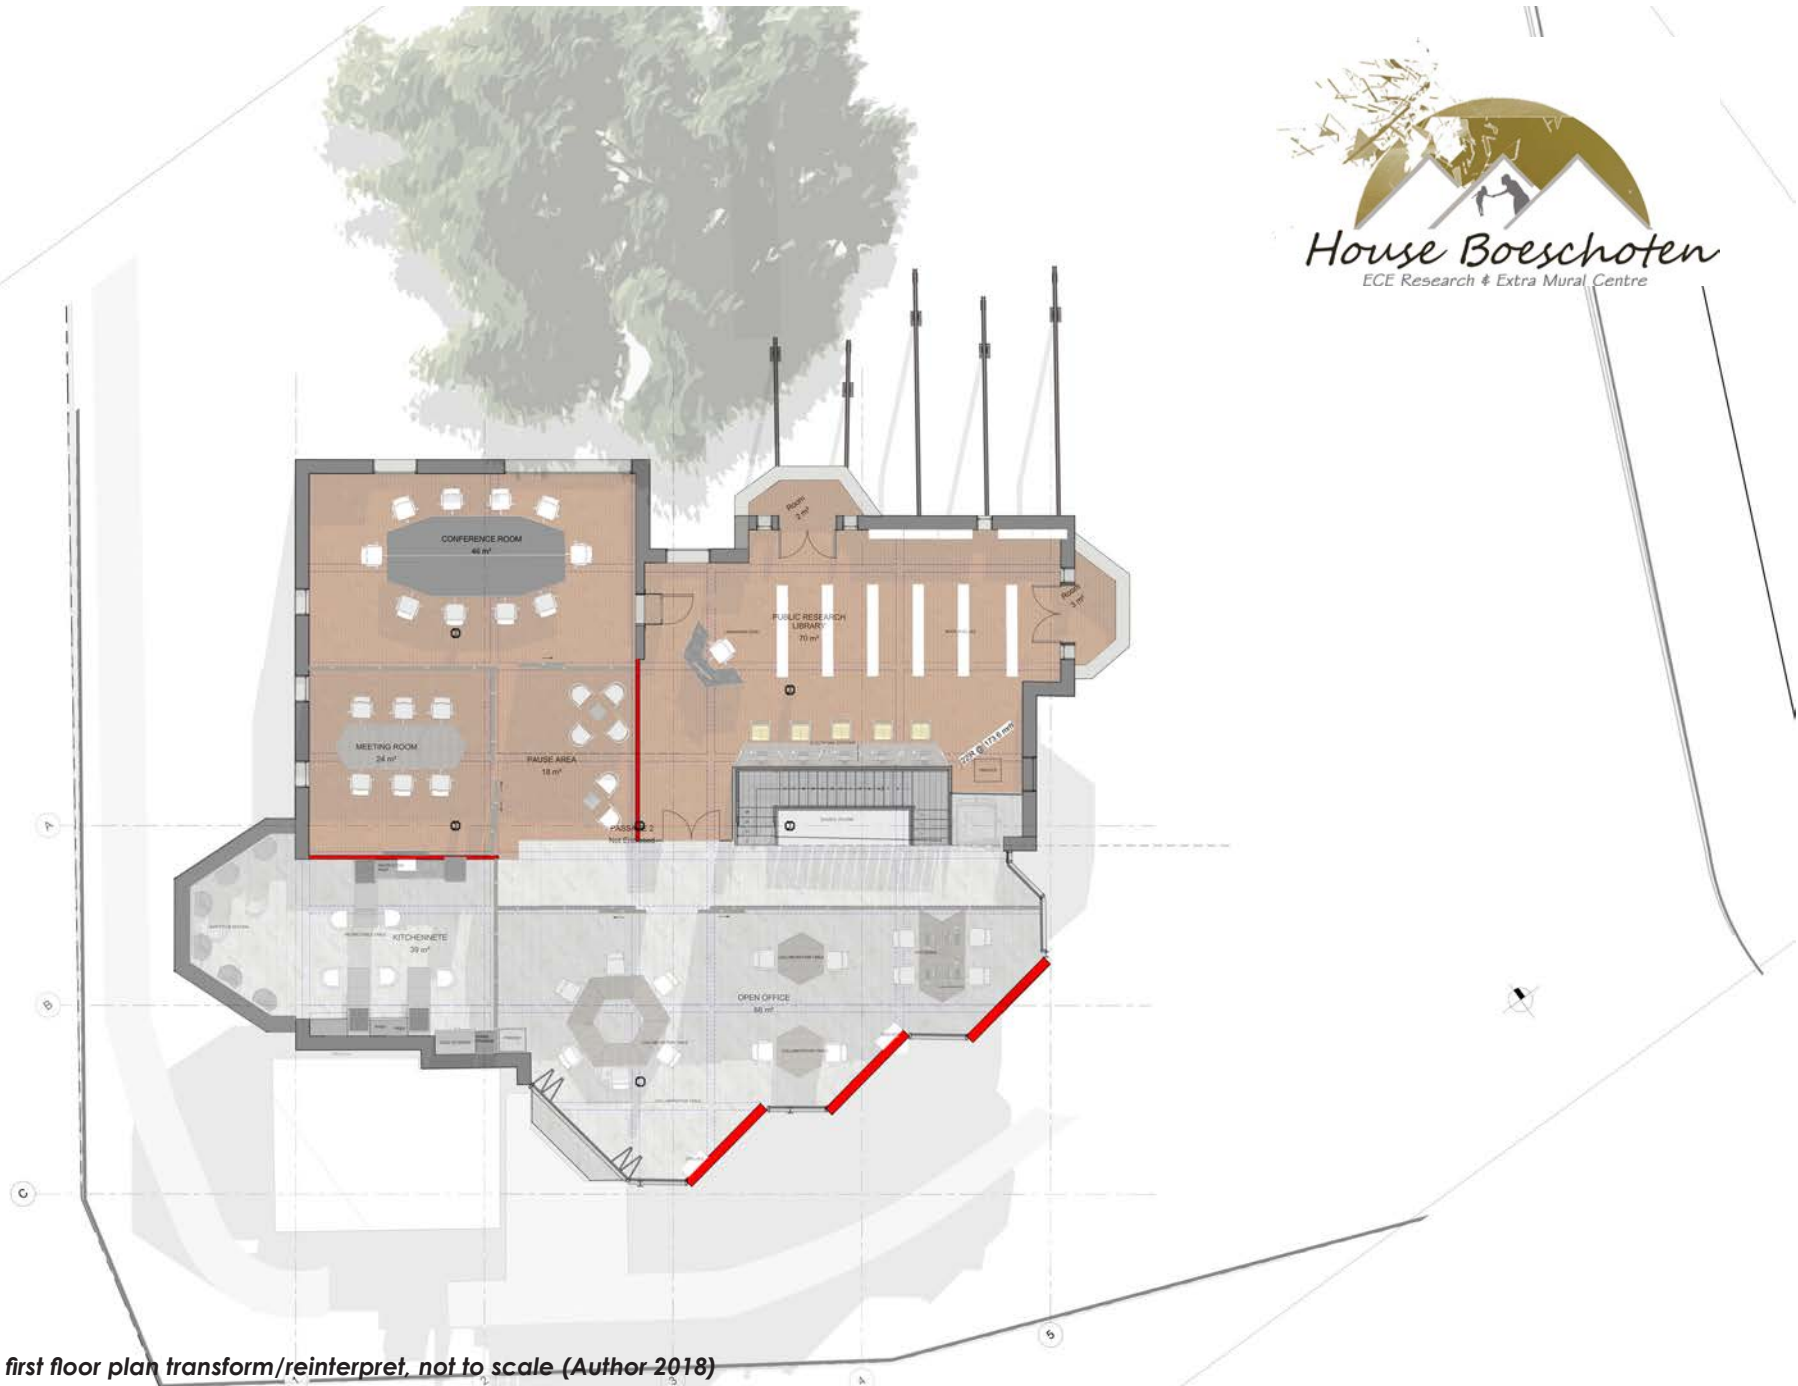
Final first floor plan transform/reinterpret, not to scale (Author 2018)
